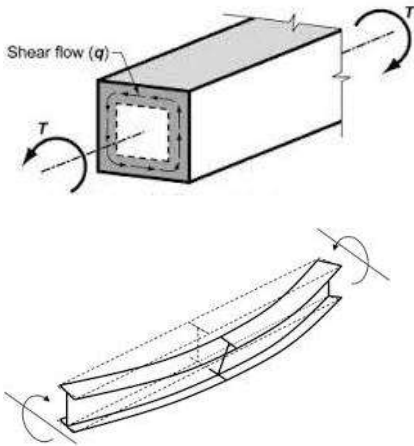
& 2.2 Torsional forces in Bridge Girder
